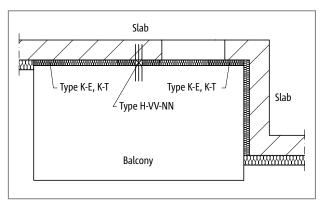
Schöck Isokorb® T type H: Cantilevered balcony
